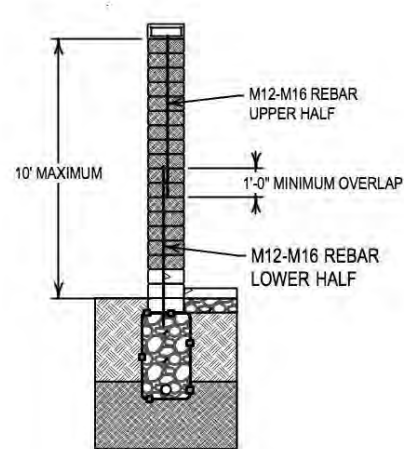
Vertical Reinforcement (Sectional View) Geiger O., (2015, September)).
